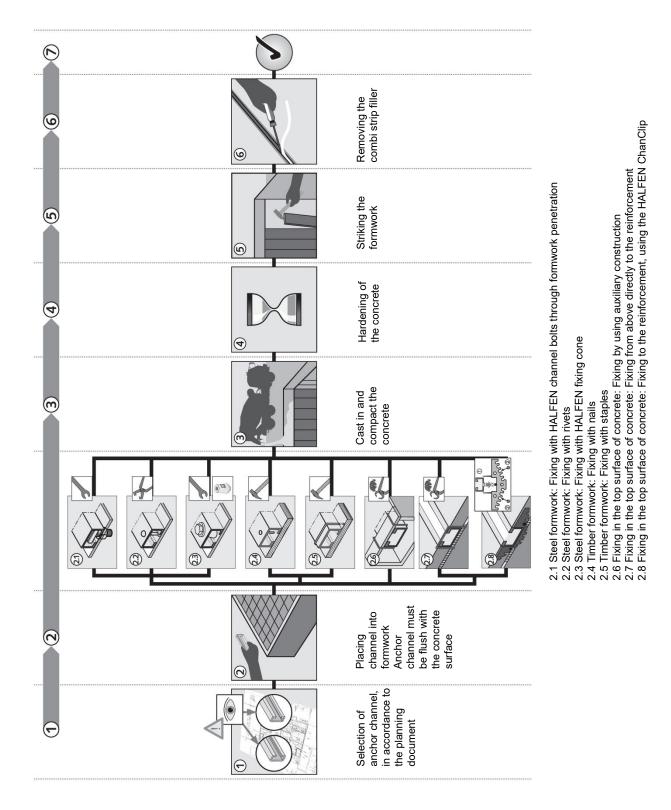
FIGURE D—HZA ANCHOR CHANNELS: INSTALLATION INSTRUCTIONS
